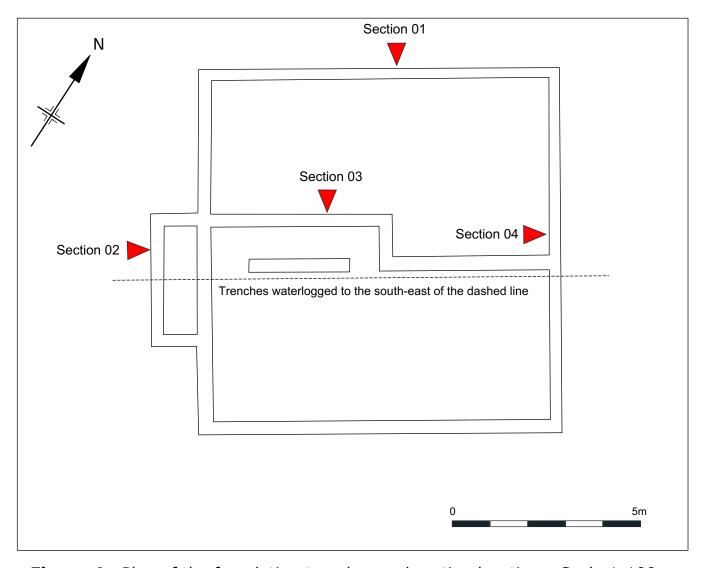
Plan of the foundation trenches and section locations. Scale 1:100.
